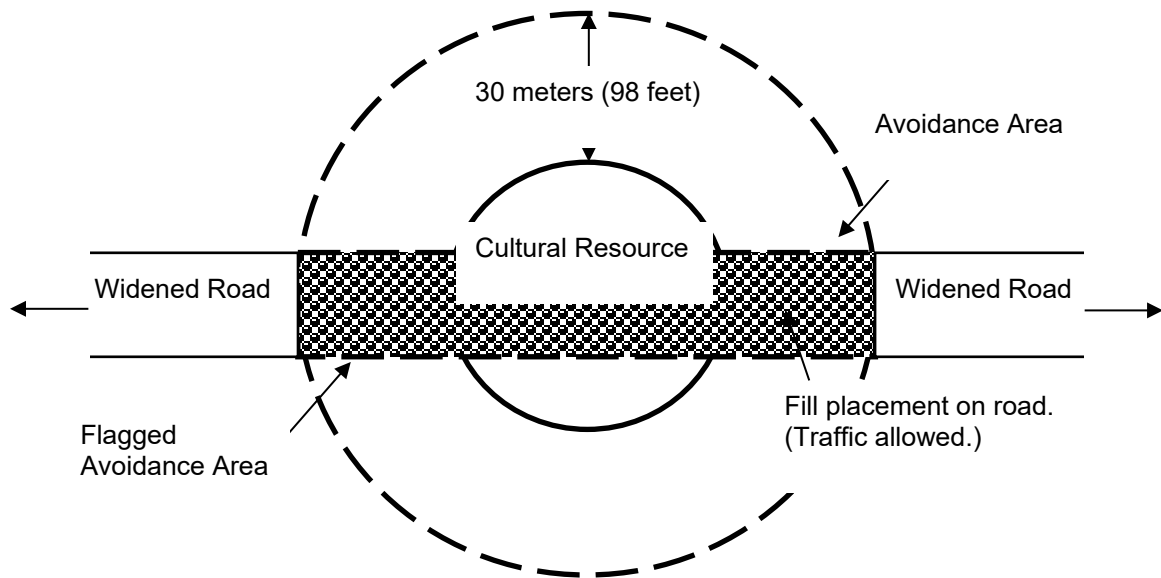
Example of Fill Placement on Existing Road and Flagging/Fencing Placement (Dashed Line) at Road Edges and at 30-meter (98-foot) Buffer on Resource Boundary (Solid Line) (Not to Scale)
